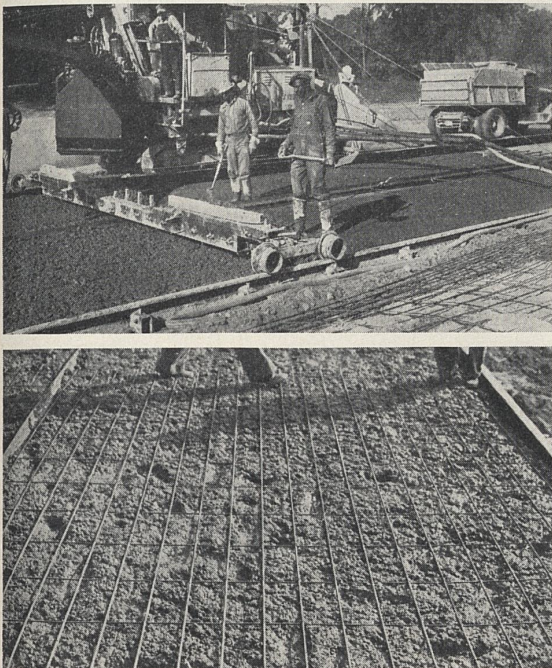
CONSTRUCTION OF SLABS HAVING WELDED FABRIC REINFORCEMENT. UPPER, STRIKING OFF CONCRETE PREPARATORY TO PLACING WELDED FABRIC; LOWER, WELDED FABRIC IN PLACE.
